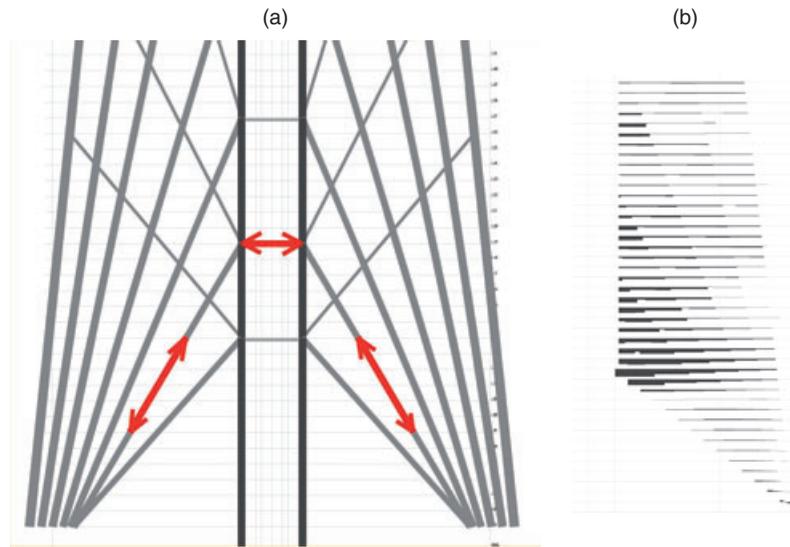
Gravity load path diagrams: (a) in fan column and links; (b) in spandrel beams
